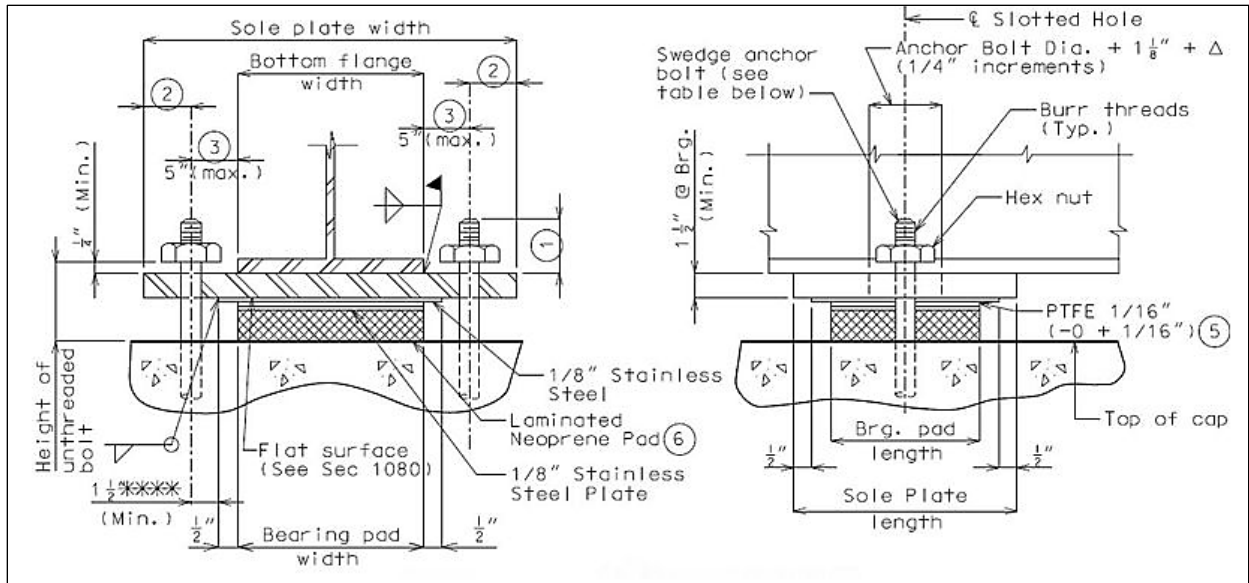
Engineering drawing image showing IDOT's Elastomeric Bearing Type II Standard Drawing with a larger stainless-steel plate on top of the PTFE.
